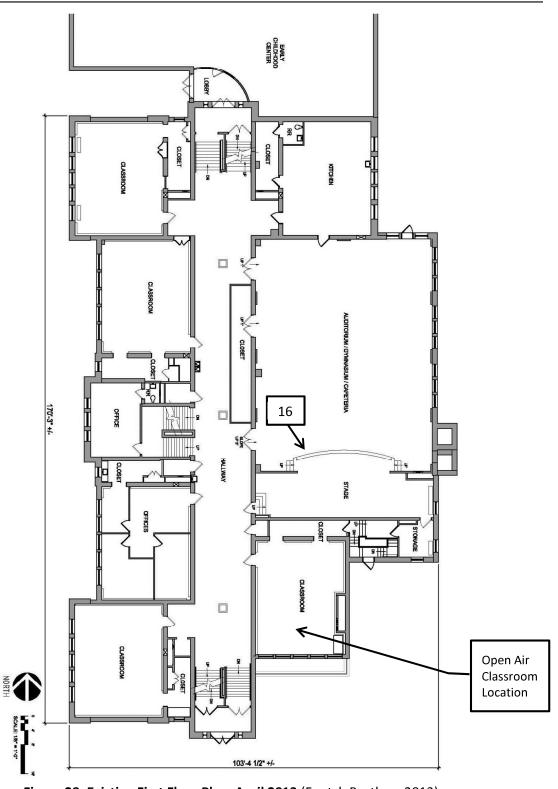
Existing First Floor Plan, April 2013 (Foutch Brothers 2013)
